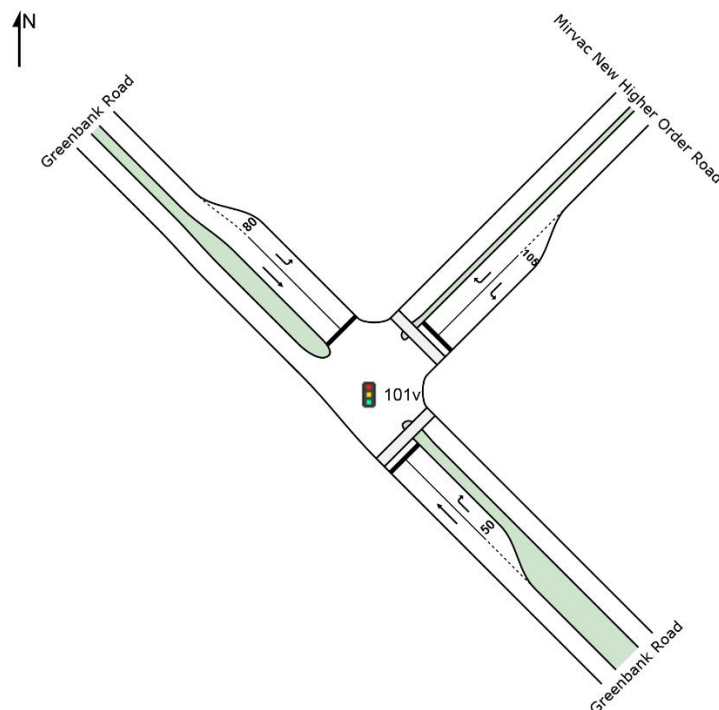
2051 Greenbank Road / High Order Road 1 Intersection Layout
